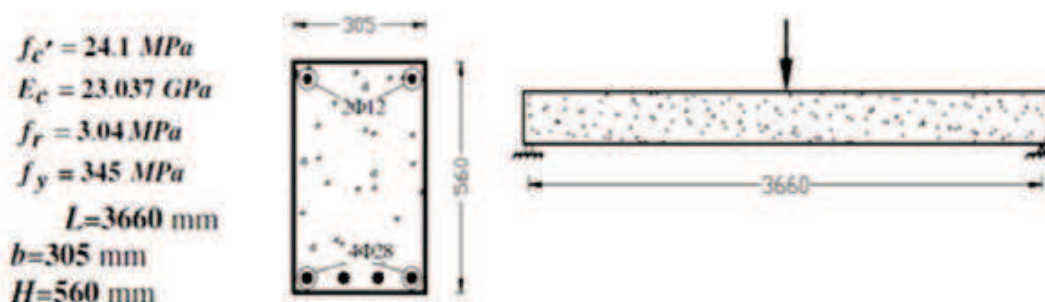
Details of a reinforced concrete simply supported beam under concentrated load at mid span with $(L/H=6.53)$ (Bresler and Scordelis)
